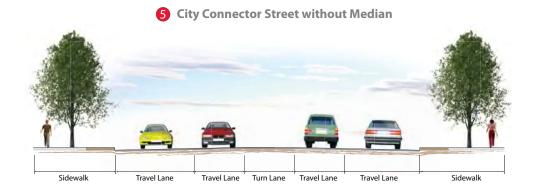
LOCAL CONNECTOR STREET
